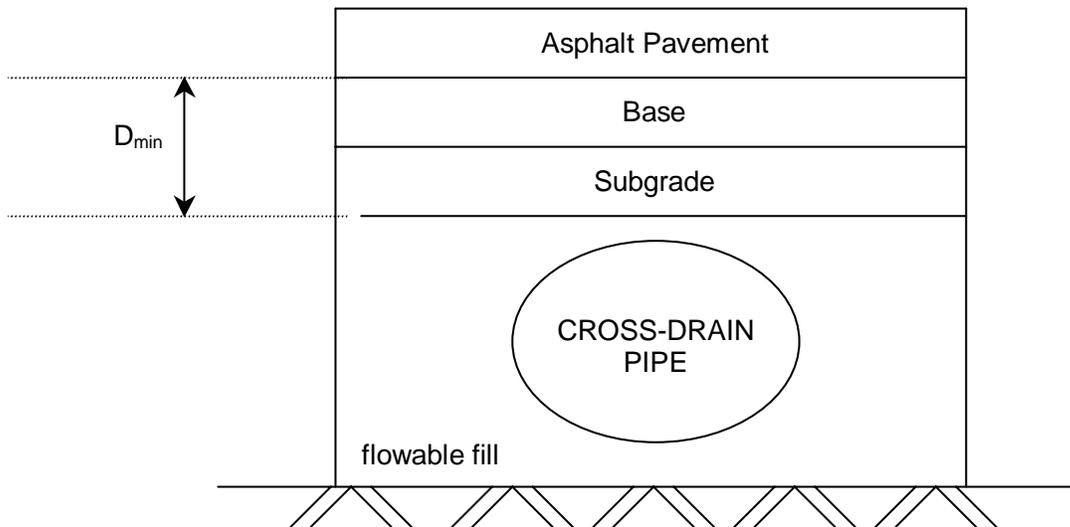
Flowable Fill Cross-drain Pipe Layout Example
